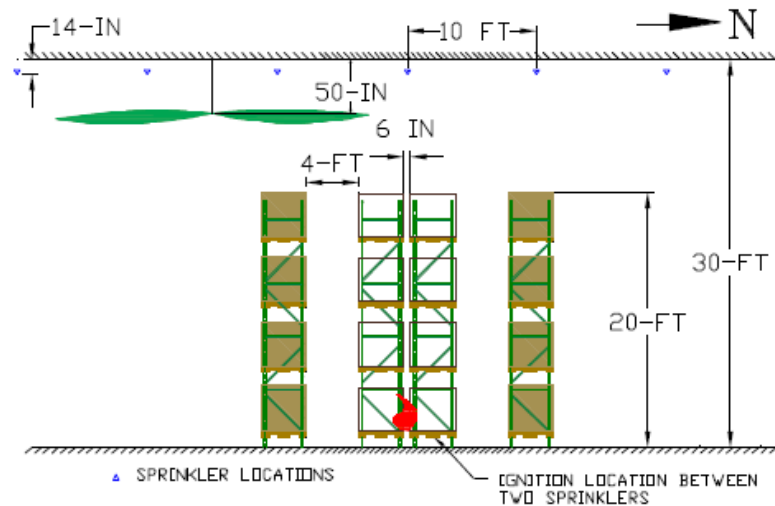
East/west elevation view of storage racks, fuel packages, ceiling fan and ignition location for the high-rack storage section tests (SEC, 2009)
